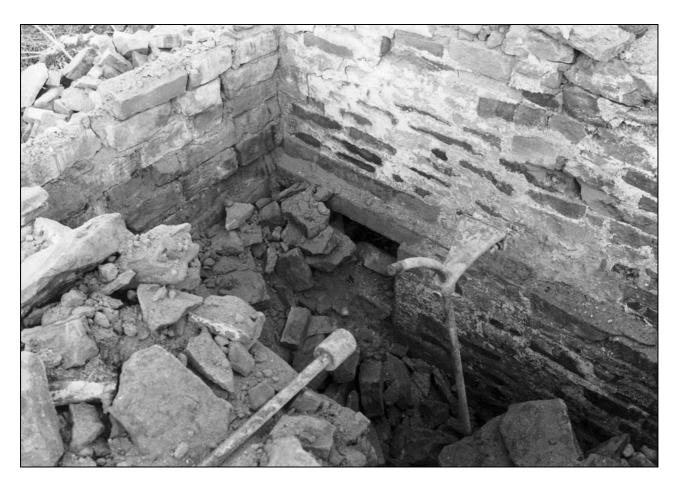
Wheelpit, as visible at start of watching brief, looking north towards doorway (film 2, frame 1)
